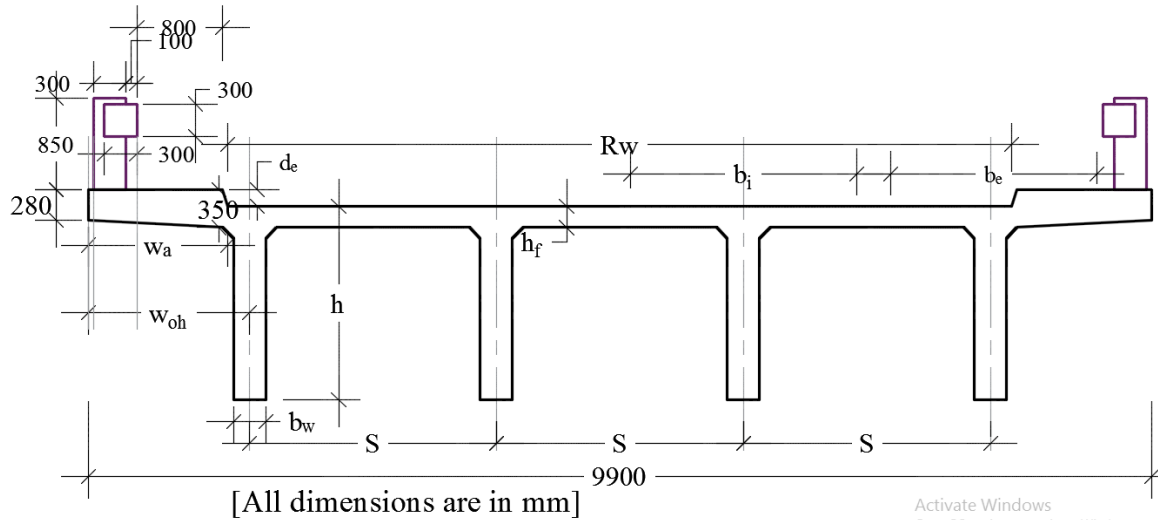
Cross Sectional Model of T-Girder Bridge
